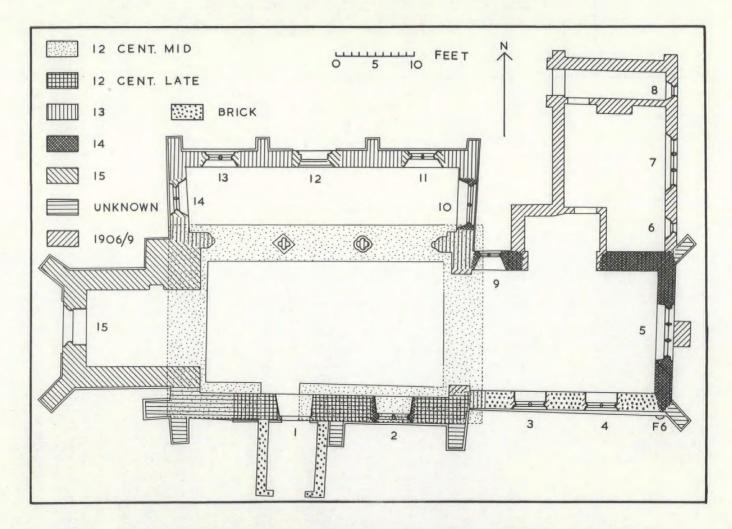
A general plan of Ravensden Church. The numbers refer to architectural details described in appendix 1.
